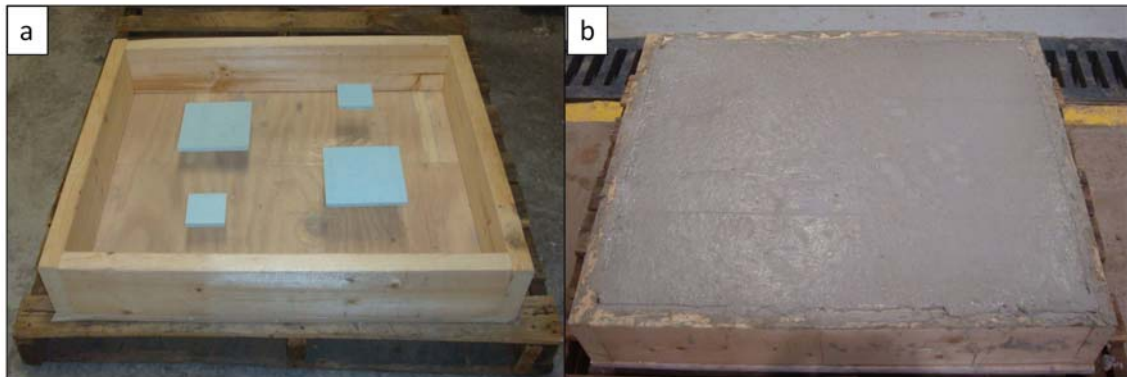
Layout of the concrete test specimen “Slab III” with simulated delaminations.
